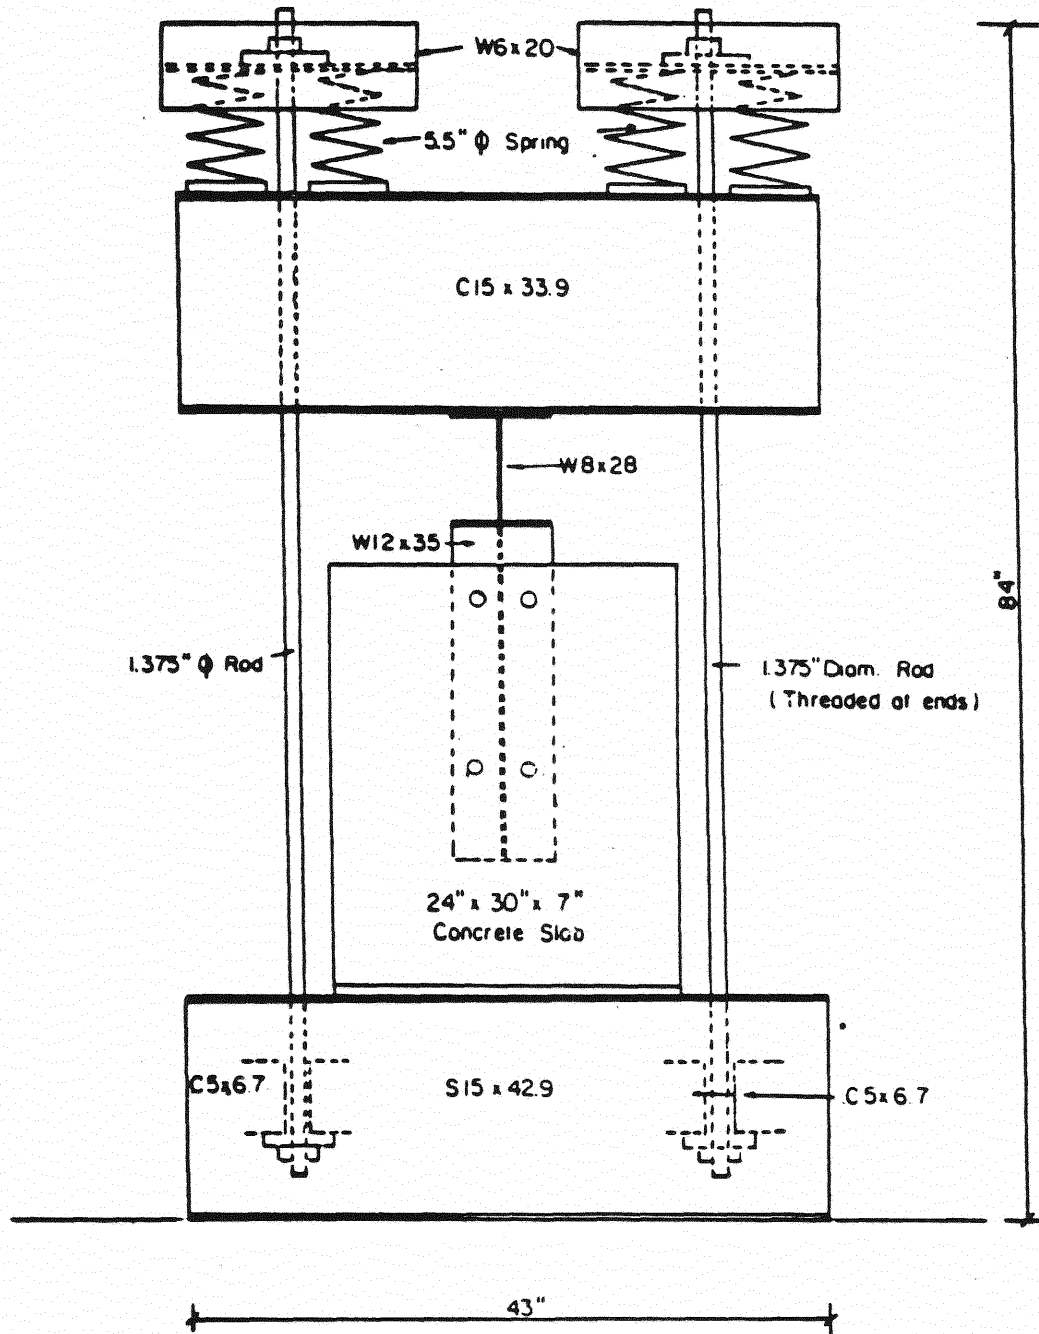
Front View of Shear Connector Specimen Sustained Loading Test Setup
